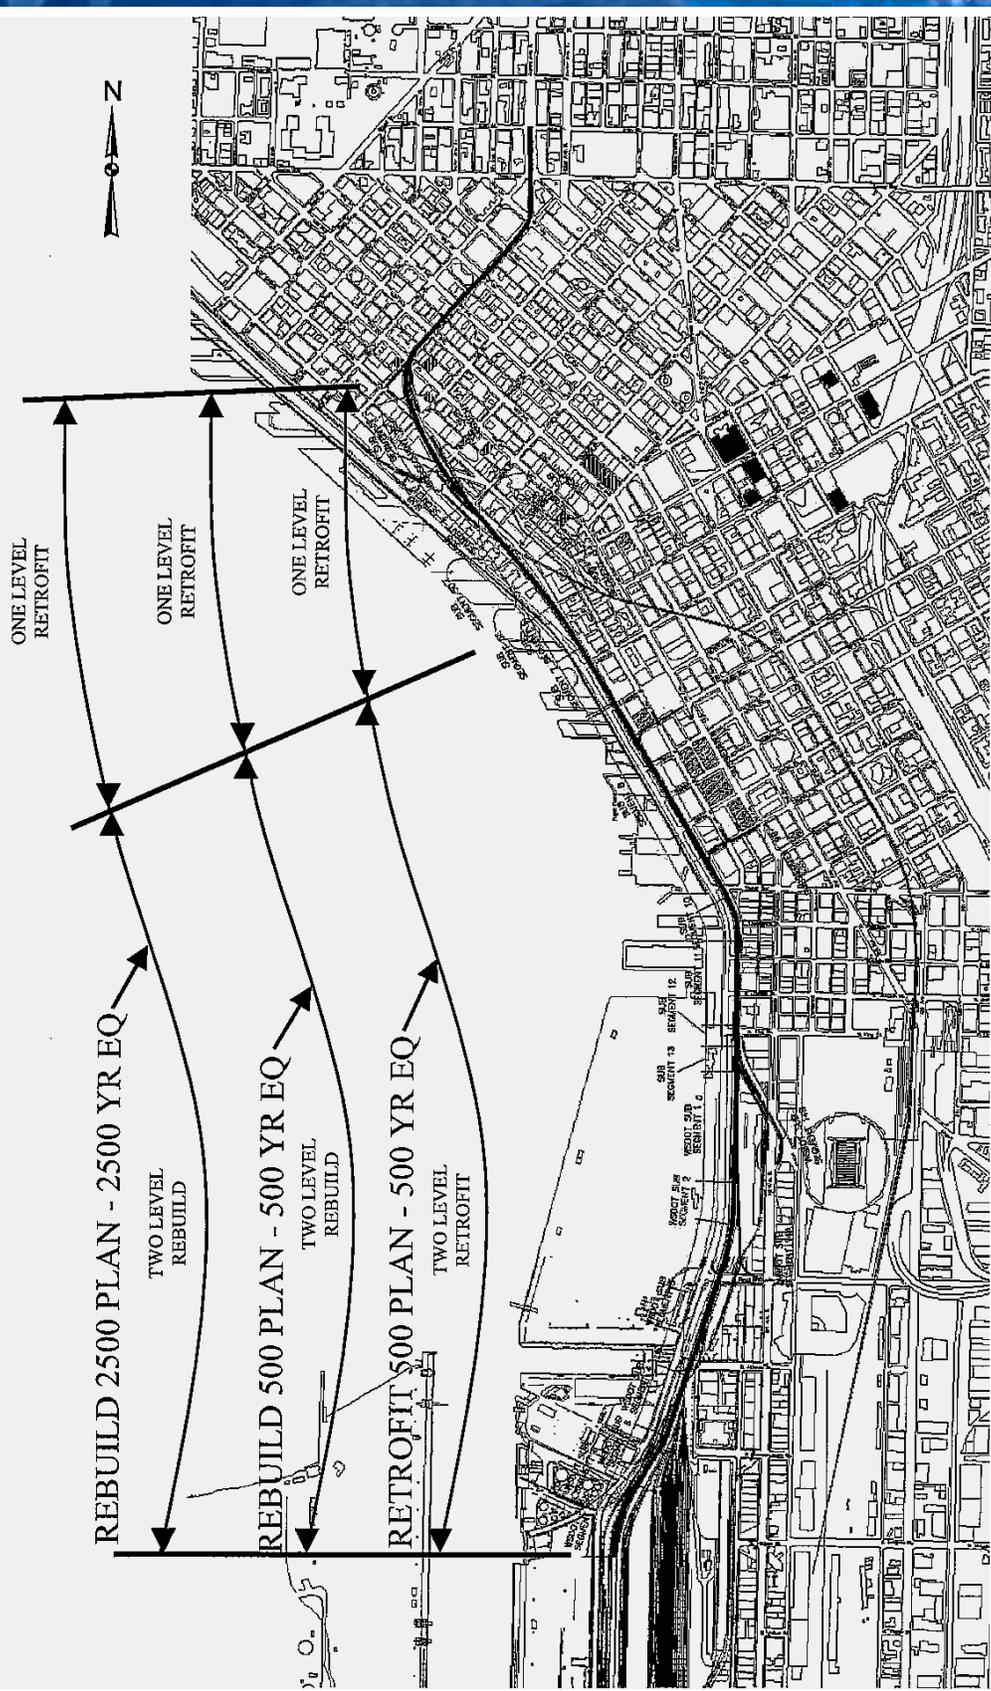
Figure 1 of Document 6 “Rebuild 2500 Plan, Rebuild 500 Plan, and Retrofit 500 Plan Location Map”
